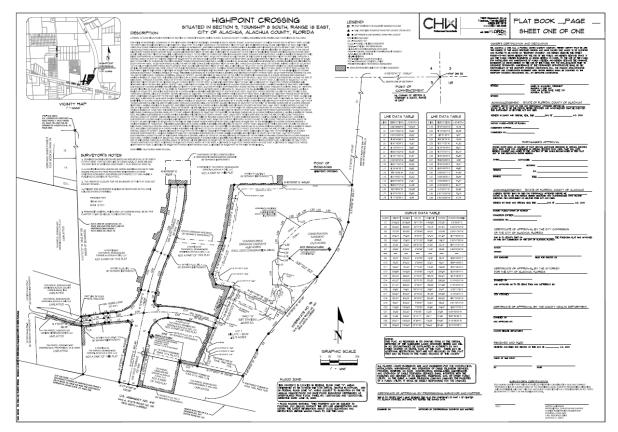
Sheet 1, Plat of HighPoint Crossing
